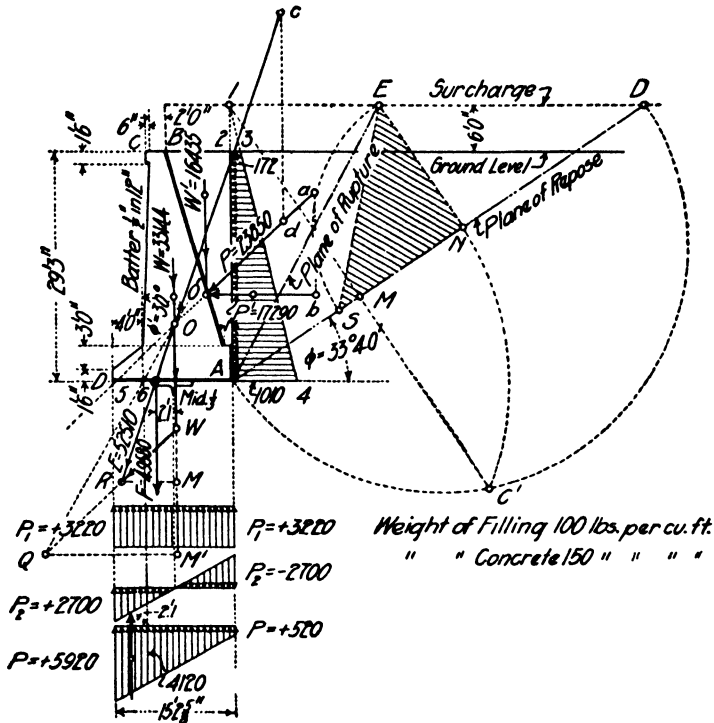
RETAINING WALL, WEST ALAMEDA AVENUE SUBWAY.
